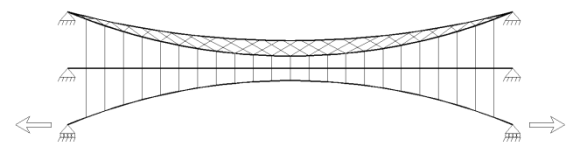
Suspension bridge stabilization by using of prestressed stabilization cable and cable truss
